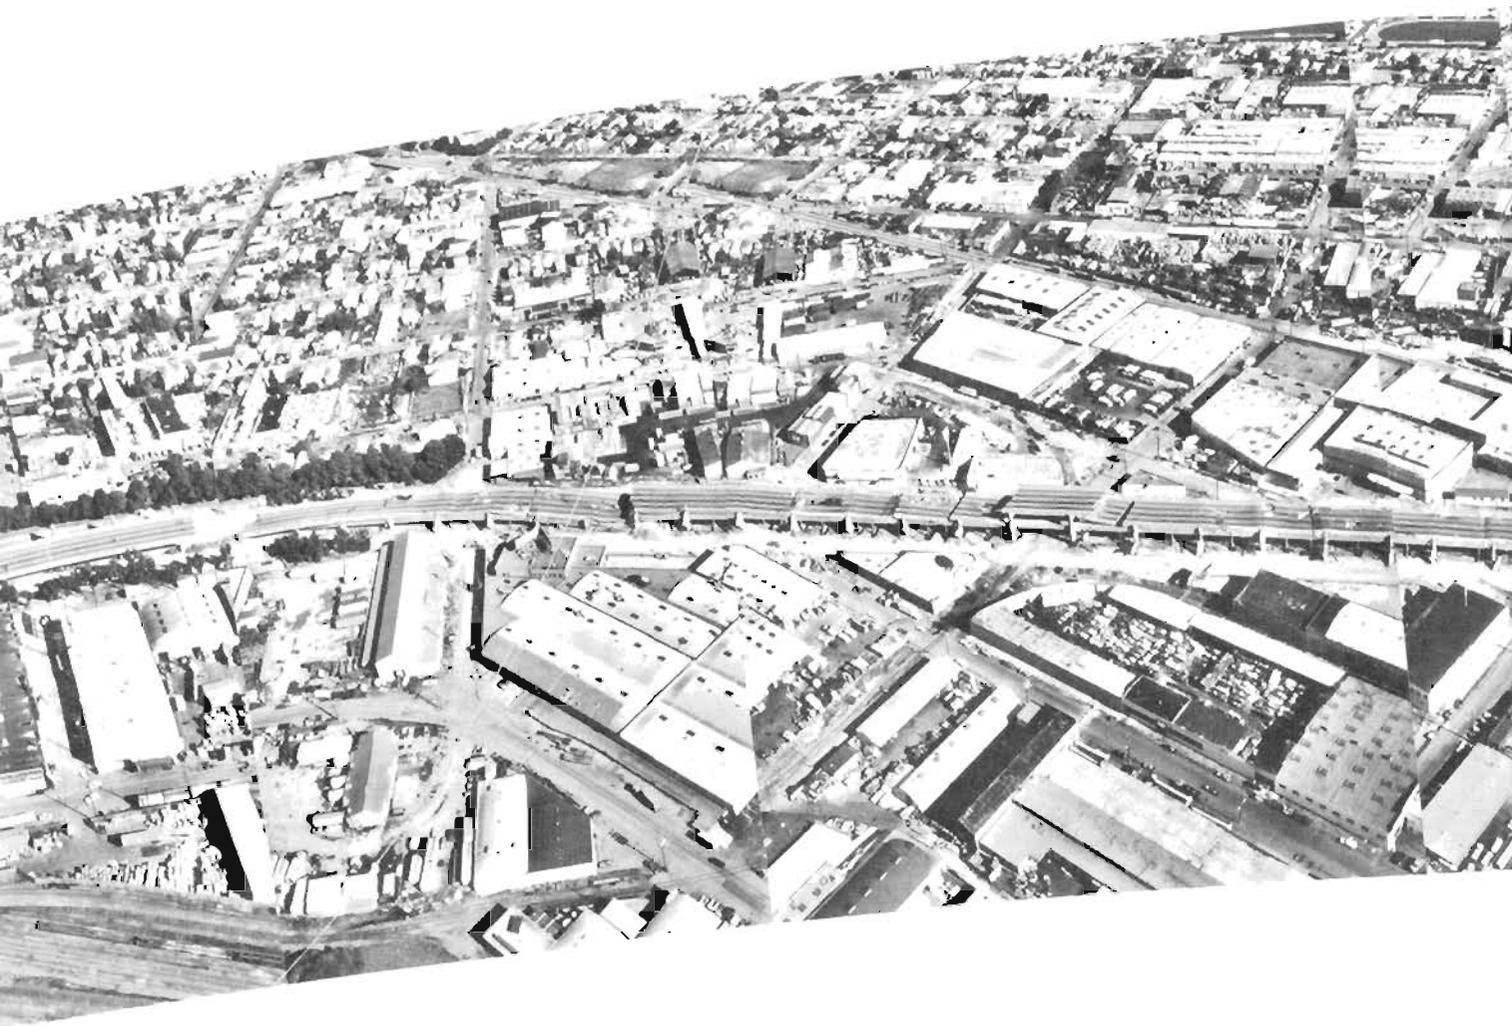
Composite aerial photograph of the Cypress Viaduct showing the extent of the collapse
